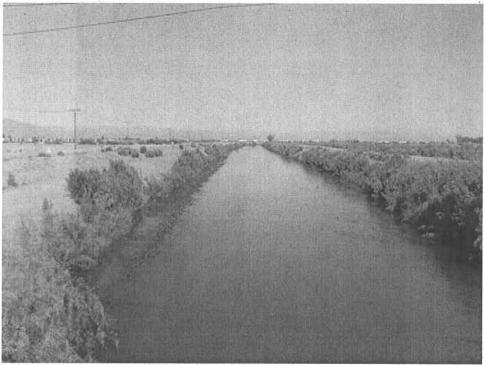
Central Main Canal from Scaroni Road, facing westward.
